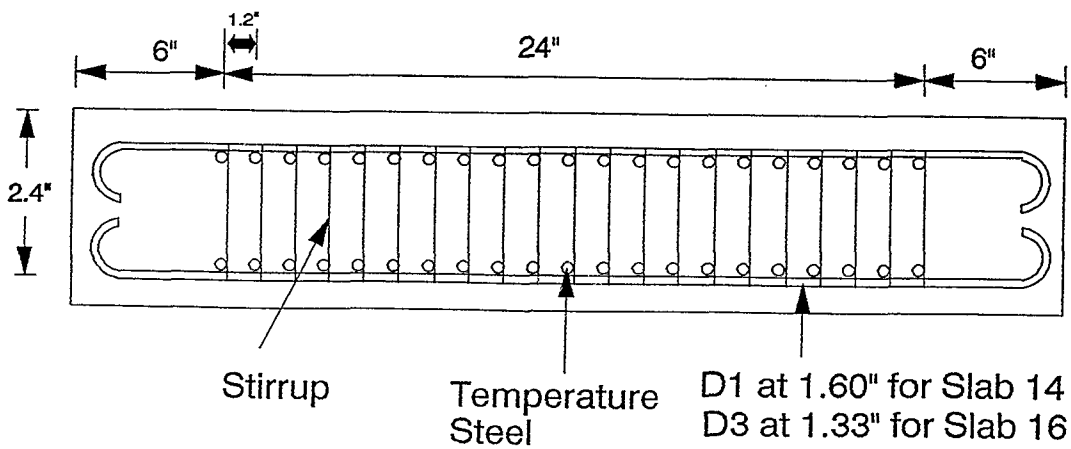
Sectional View Through Length of Slabs No. 14 and 16
